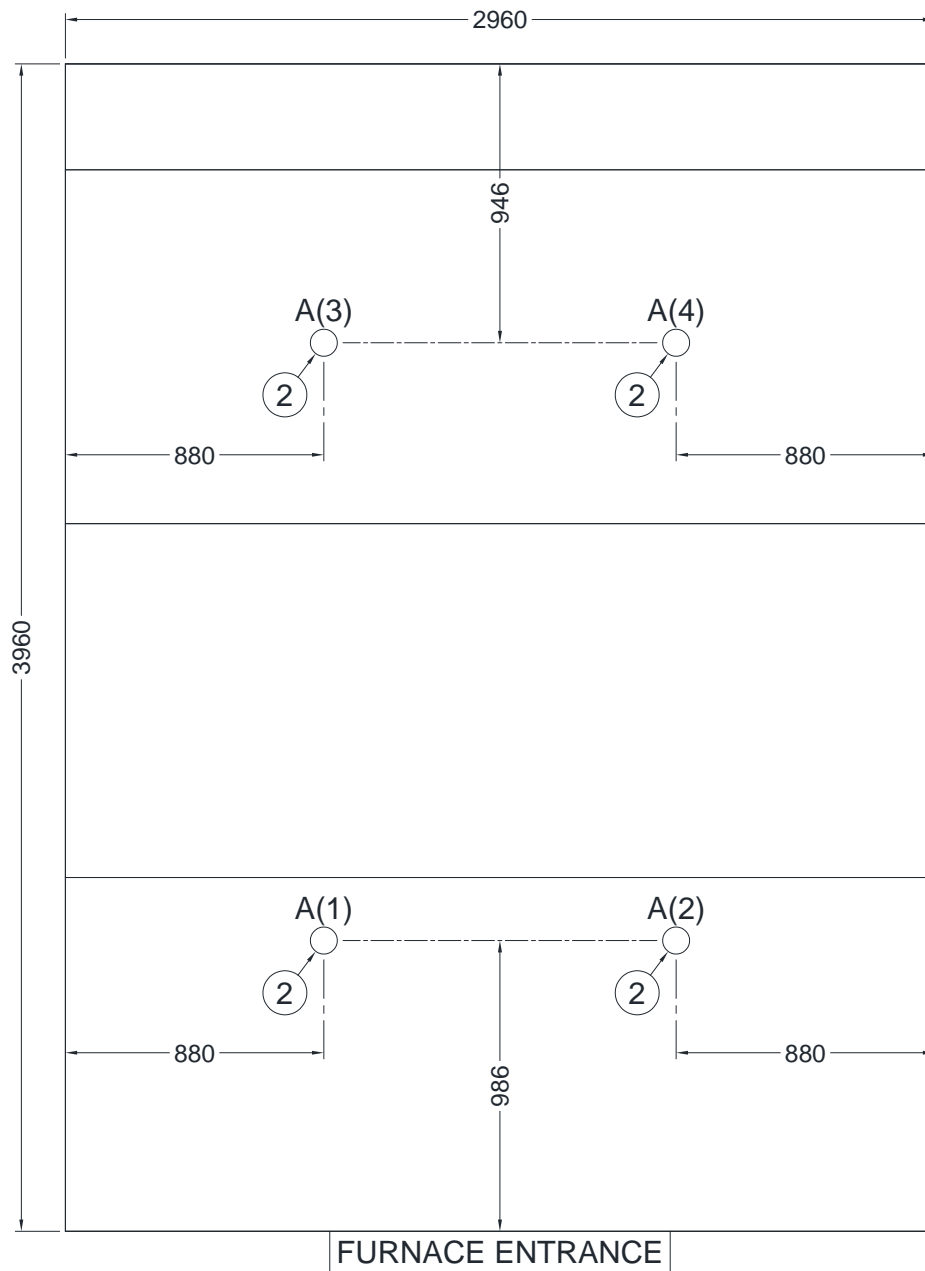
General Elevation of the Unexposed Face of the Test Construction
